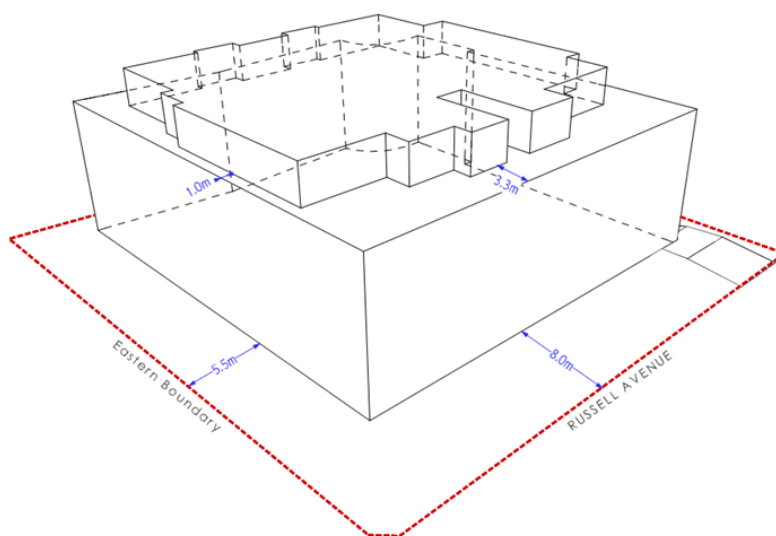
Indicative building envelope with minimum setbacks indicated (north-east view)
